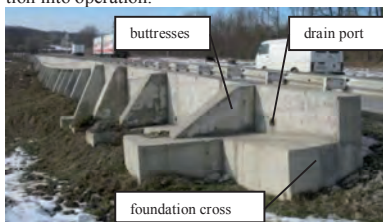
Lower retaining wall at the section of A-147 highway Dzhubga – Sochi
